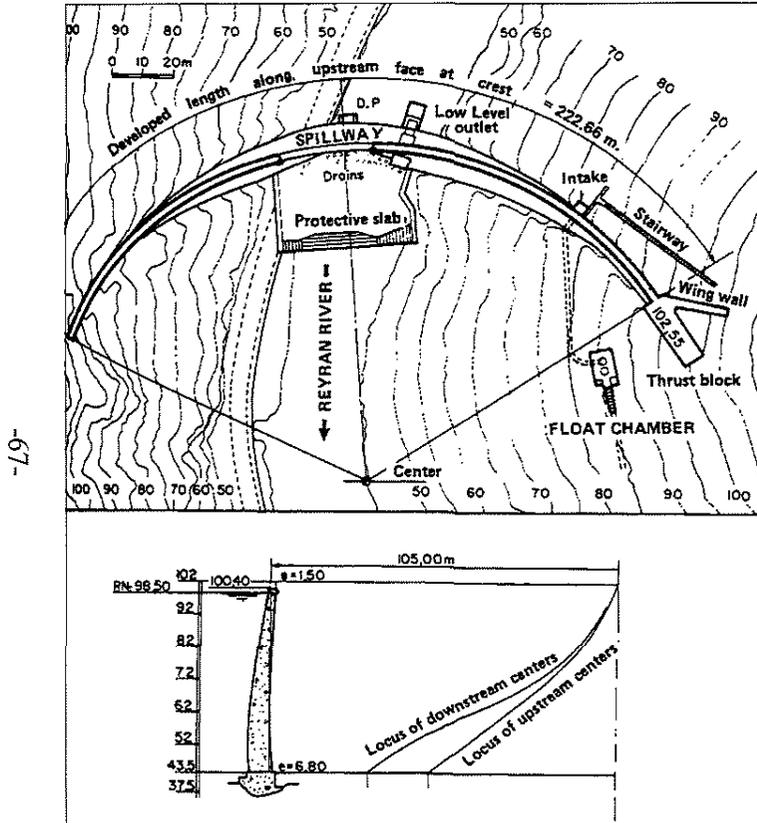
General plan and section of Malpasset Dam (after Londe, 1987)
